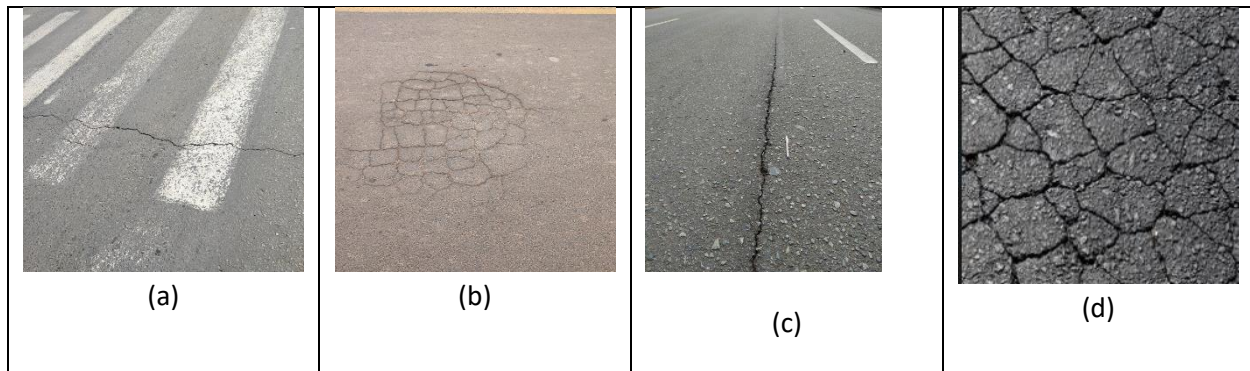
Samples of the subtypes of pavement crack images in the dataset: (a) transverse, (b) alligator, (c) longitudinal and block (d).
